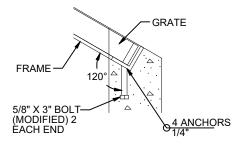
DETAIL A (ANCHOR BOLT DETAIL, SEE NOTE 2)
